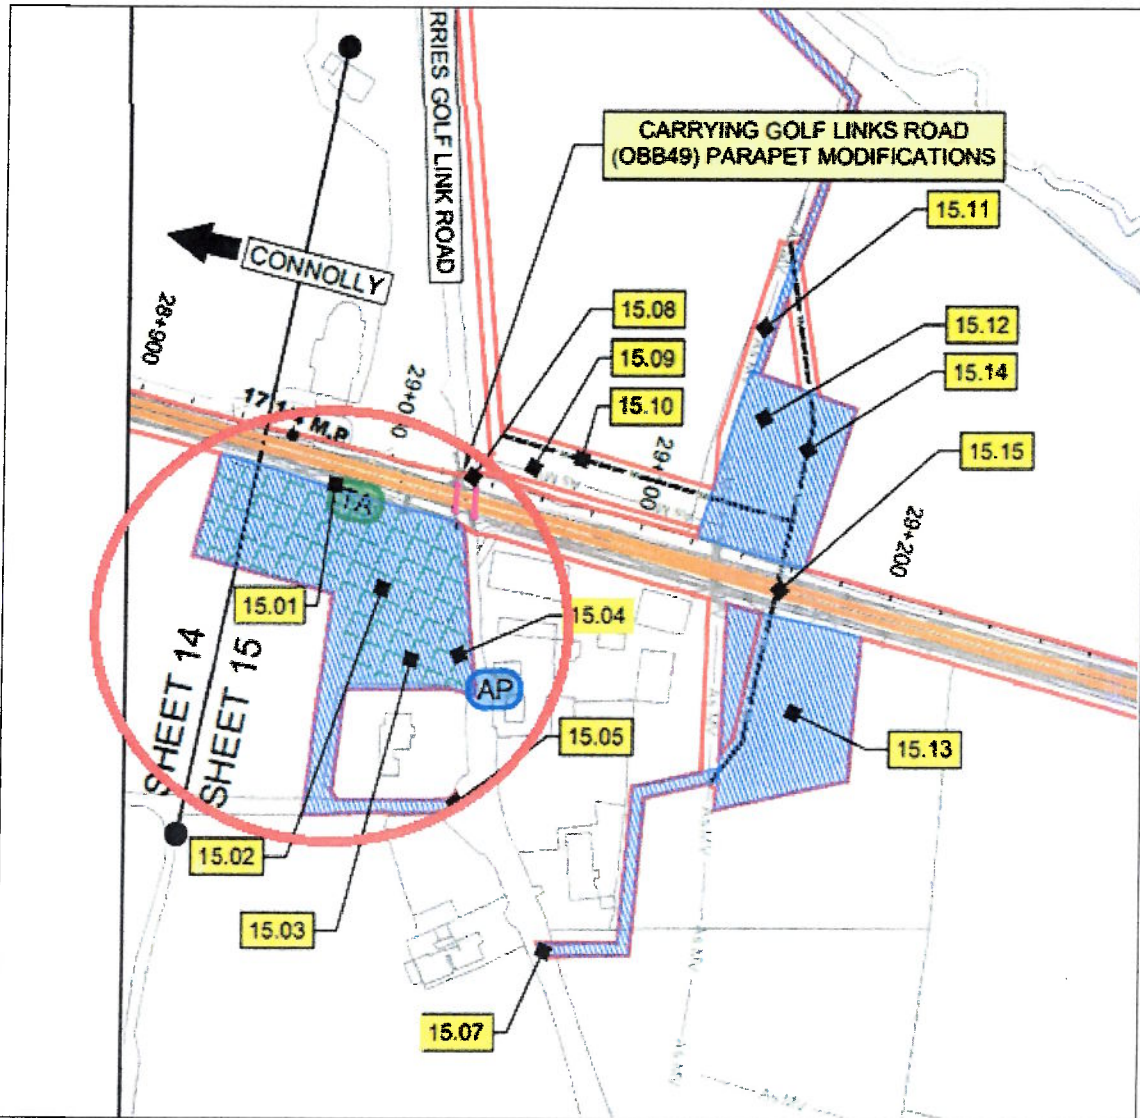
Annotated extract from Works Layout Plan 15 in Book 1 of the Railway Works Plan (approximate area our Clients lands subject to the works are circled in red). It cross references a schedule of works (extract at Figure 6). Work refs. 15.01, 15.02, 15.03, 15.4, 15.05, TA (existing track access point) and AP (proposed compound access point) are proposed on our Clients lands.
